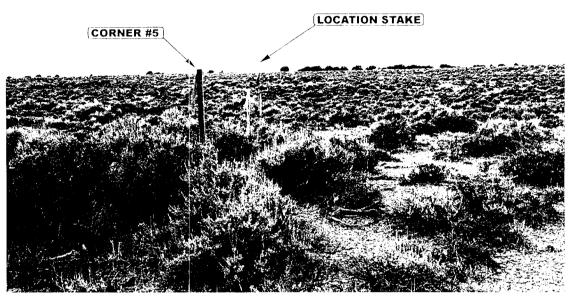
PHOTO: VIEW FROM CORNER #5 TO LOCATION STAKE
